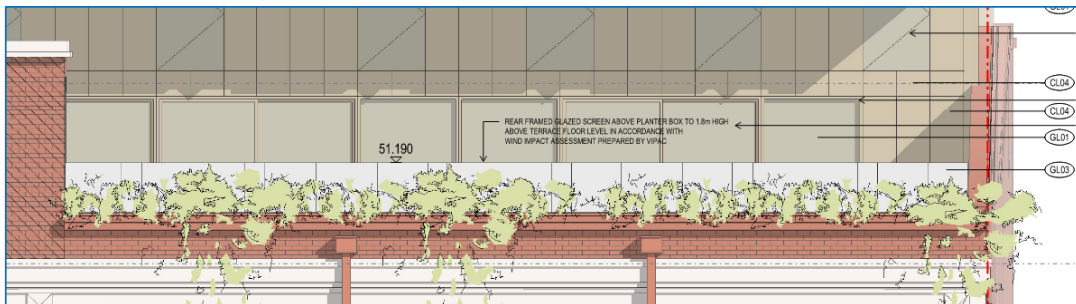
Excerpt of north elevation of the proposal noting glass balustrade behind parapet (Source: Hayball – revision 2, dated May 2025).
